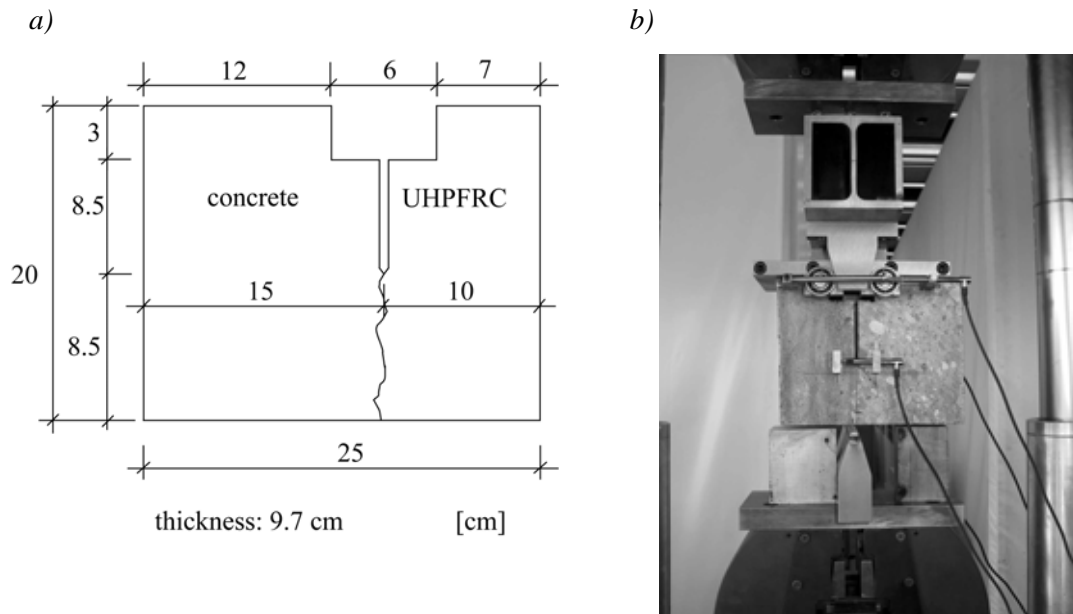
a) Dimensions, b) test set-up of the WST specimens
